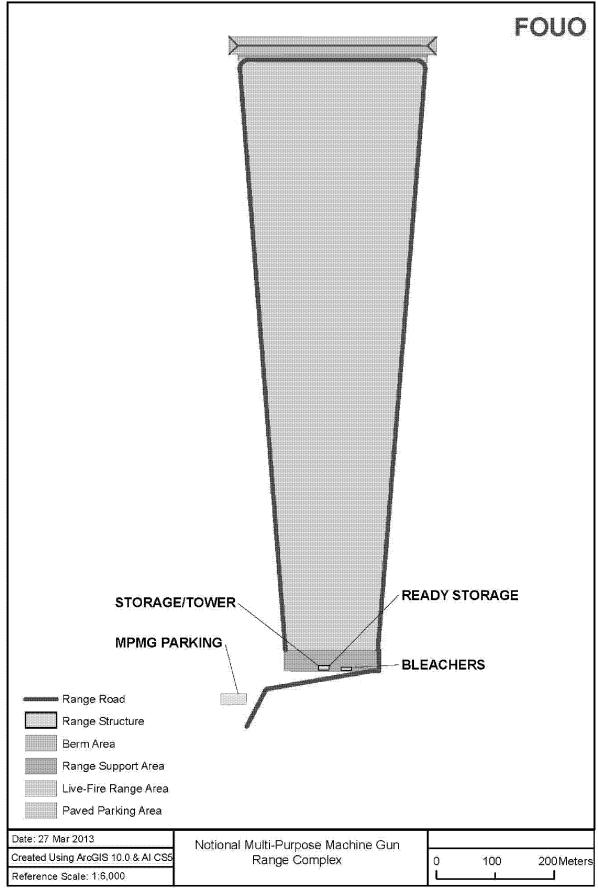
Notional Multi-Purpose Machine Gun Range Complex
